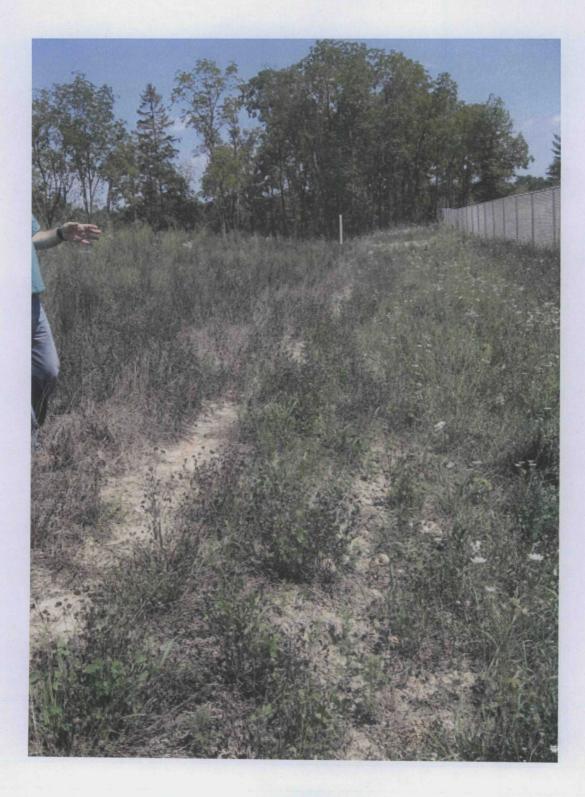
Erosion and exposed geotextile liner at southwest surface water swale
